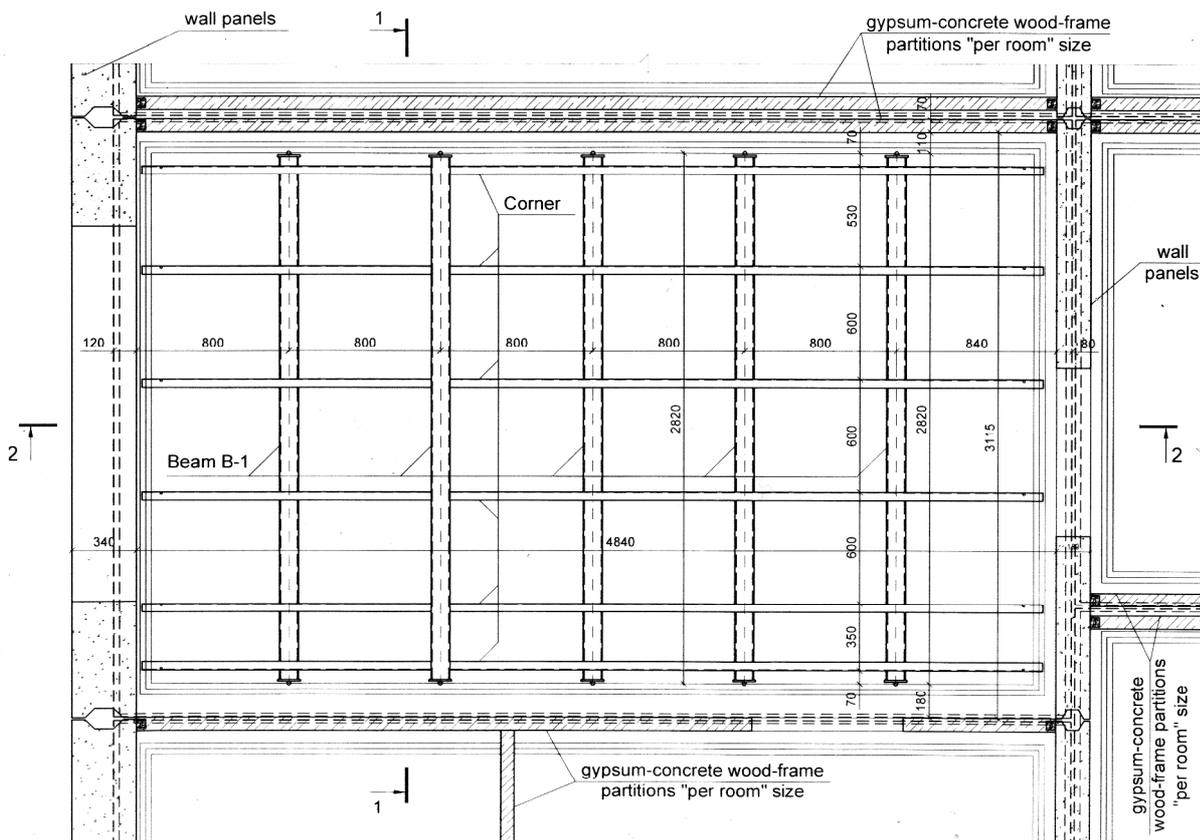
The construction of the reinforcement of the floor slab raised panel. Plan view
